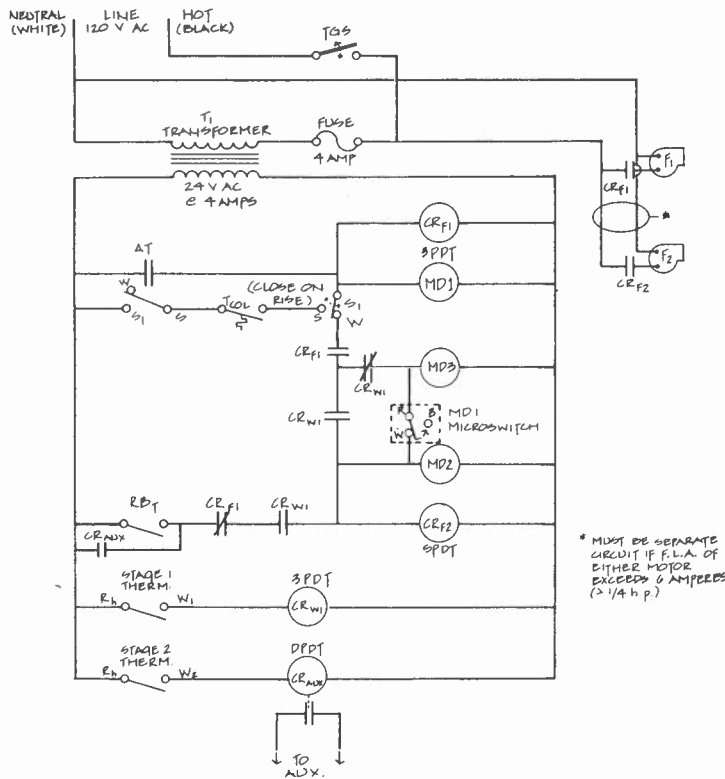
New Construction Wiring Schematic: Series Auxiliary Roof Collector With Storage and Power Venting
